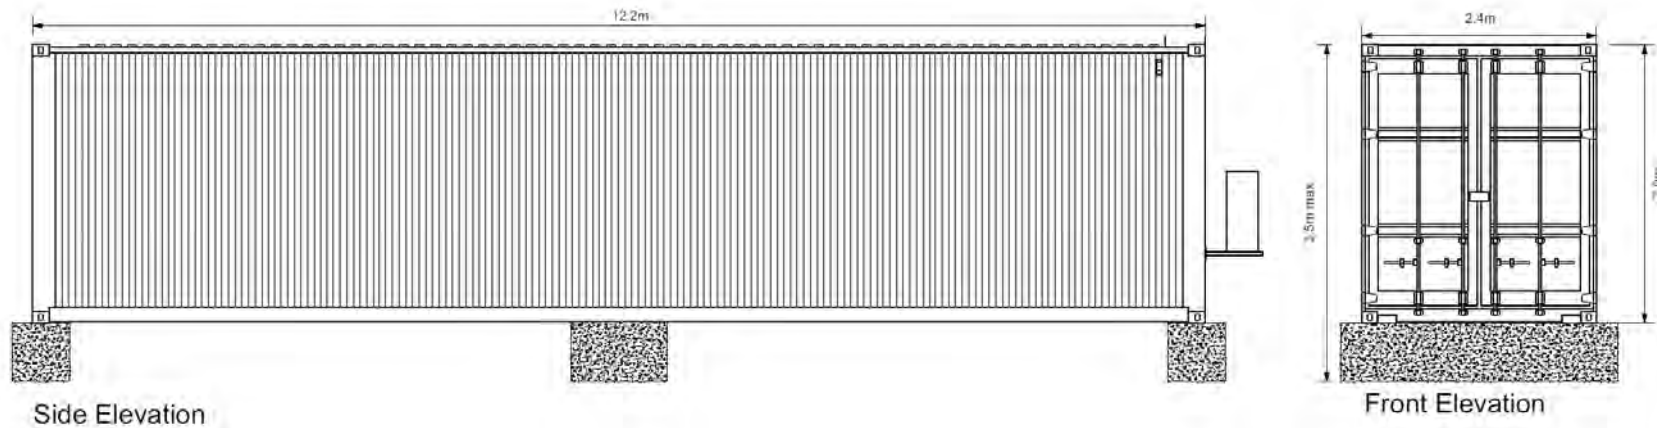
BESS Container Front and Side Elevation (Extracted from BESS Battery Container Elevations [EN010140/APP/6.2.3.7])
